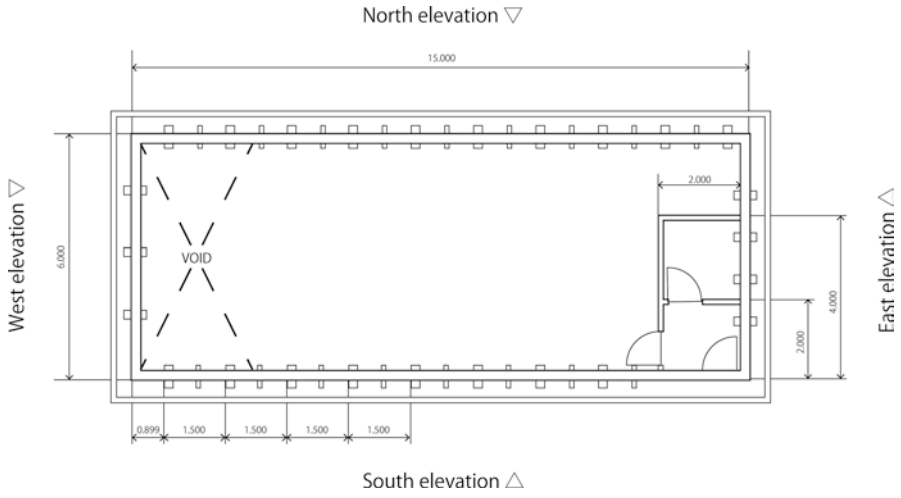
Example of floor plans for a swiftlet house (metres)
